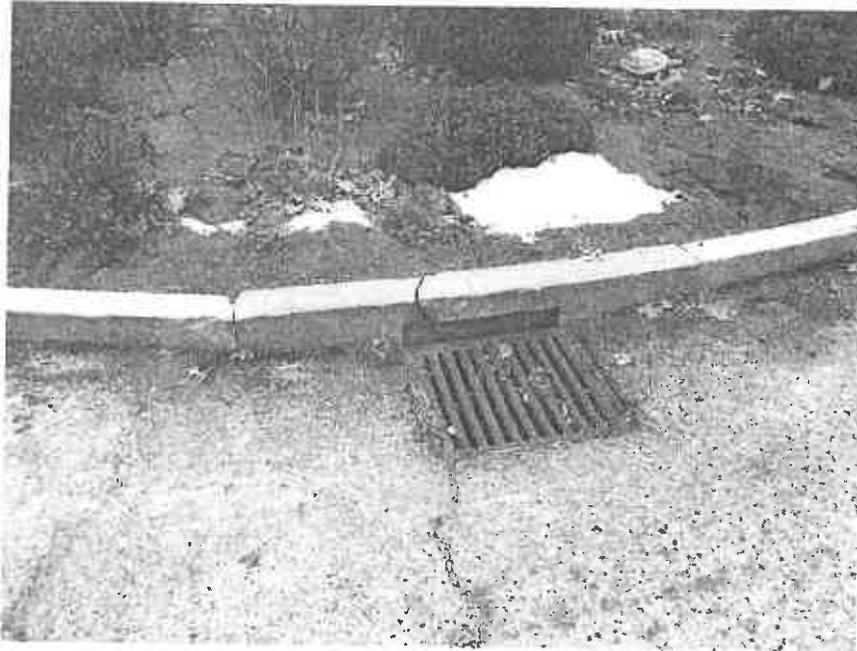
Headstone for CB-43 at the corner of Washington Street and Lincoln Circle has cracked and should be replaced.
